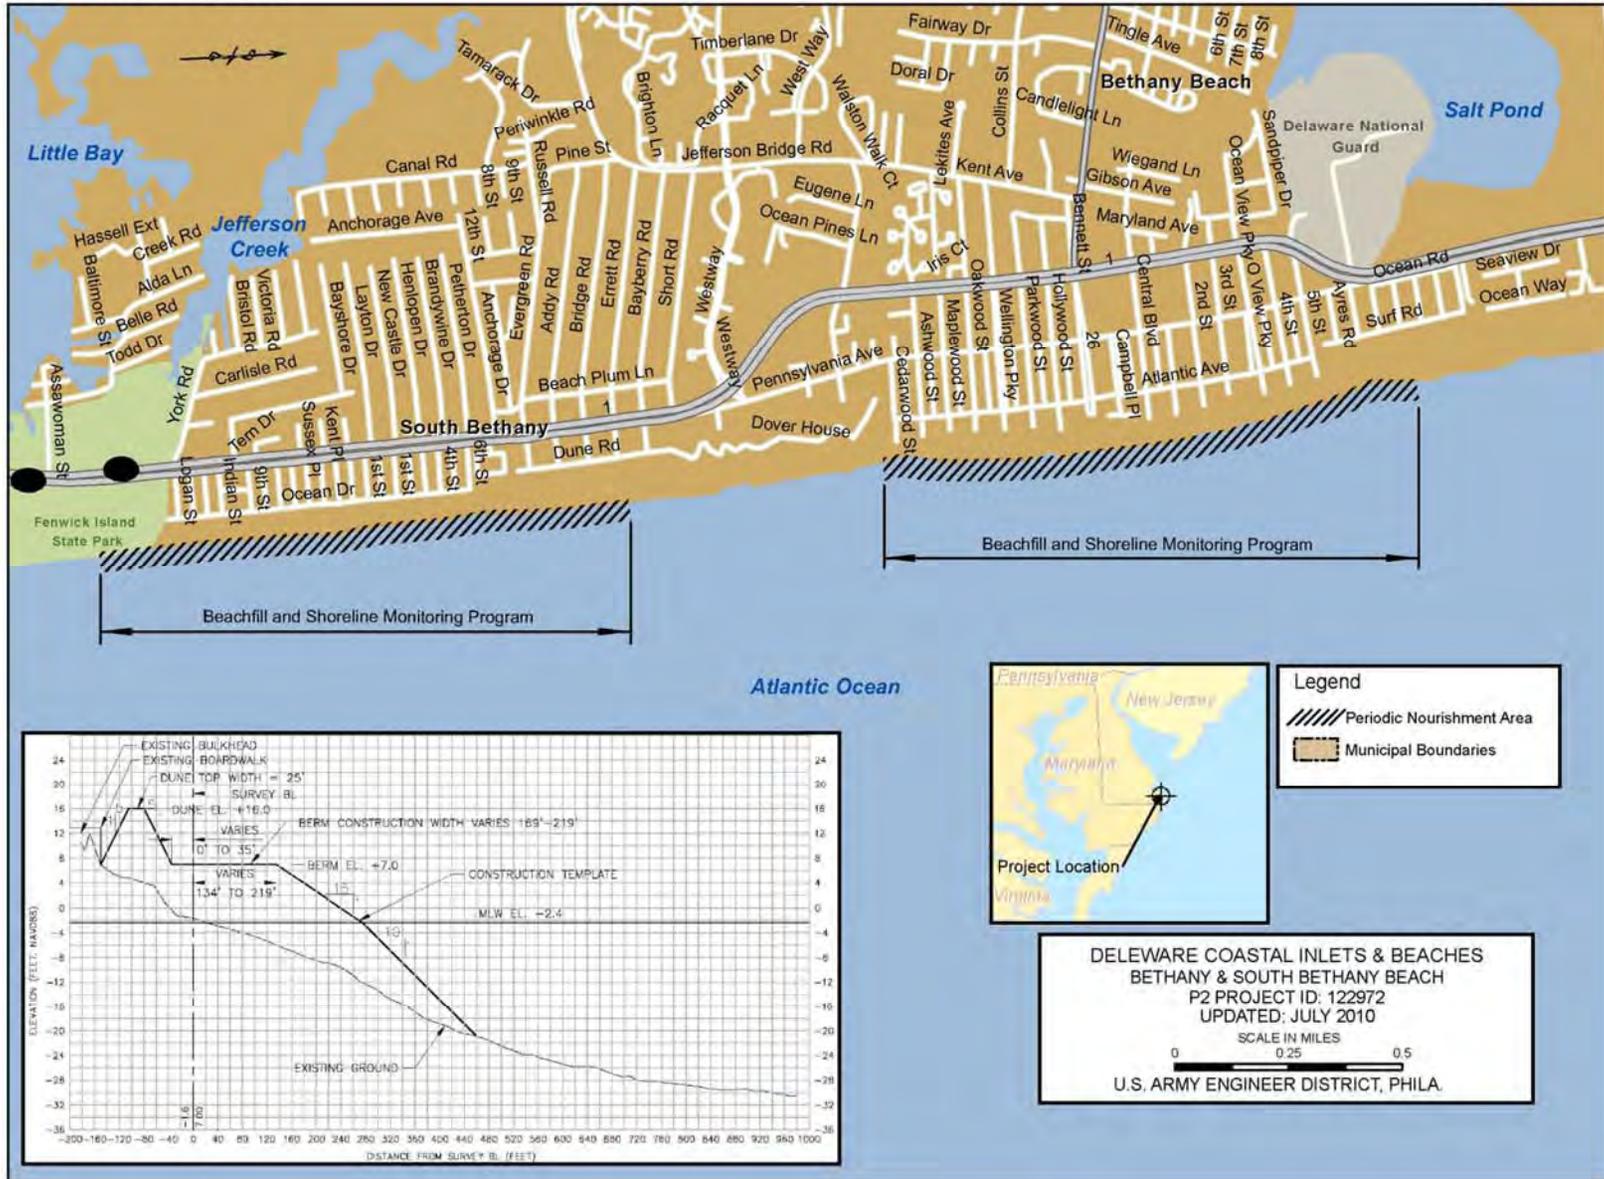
Bethany Beach and South Bethany Project Plan and Template.
